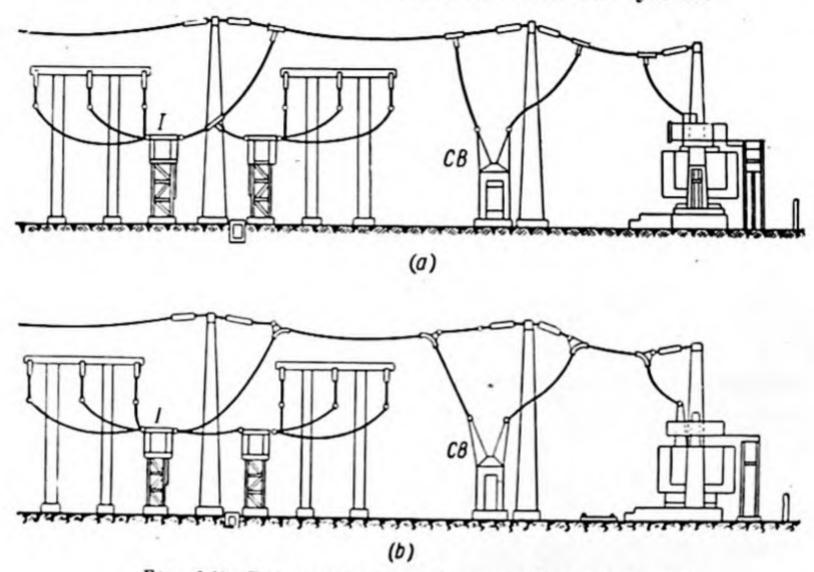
Bus arrangement in an outdoor substation: a-incorrect; b-correct
